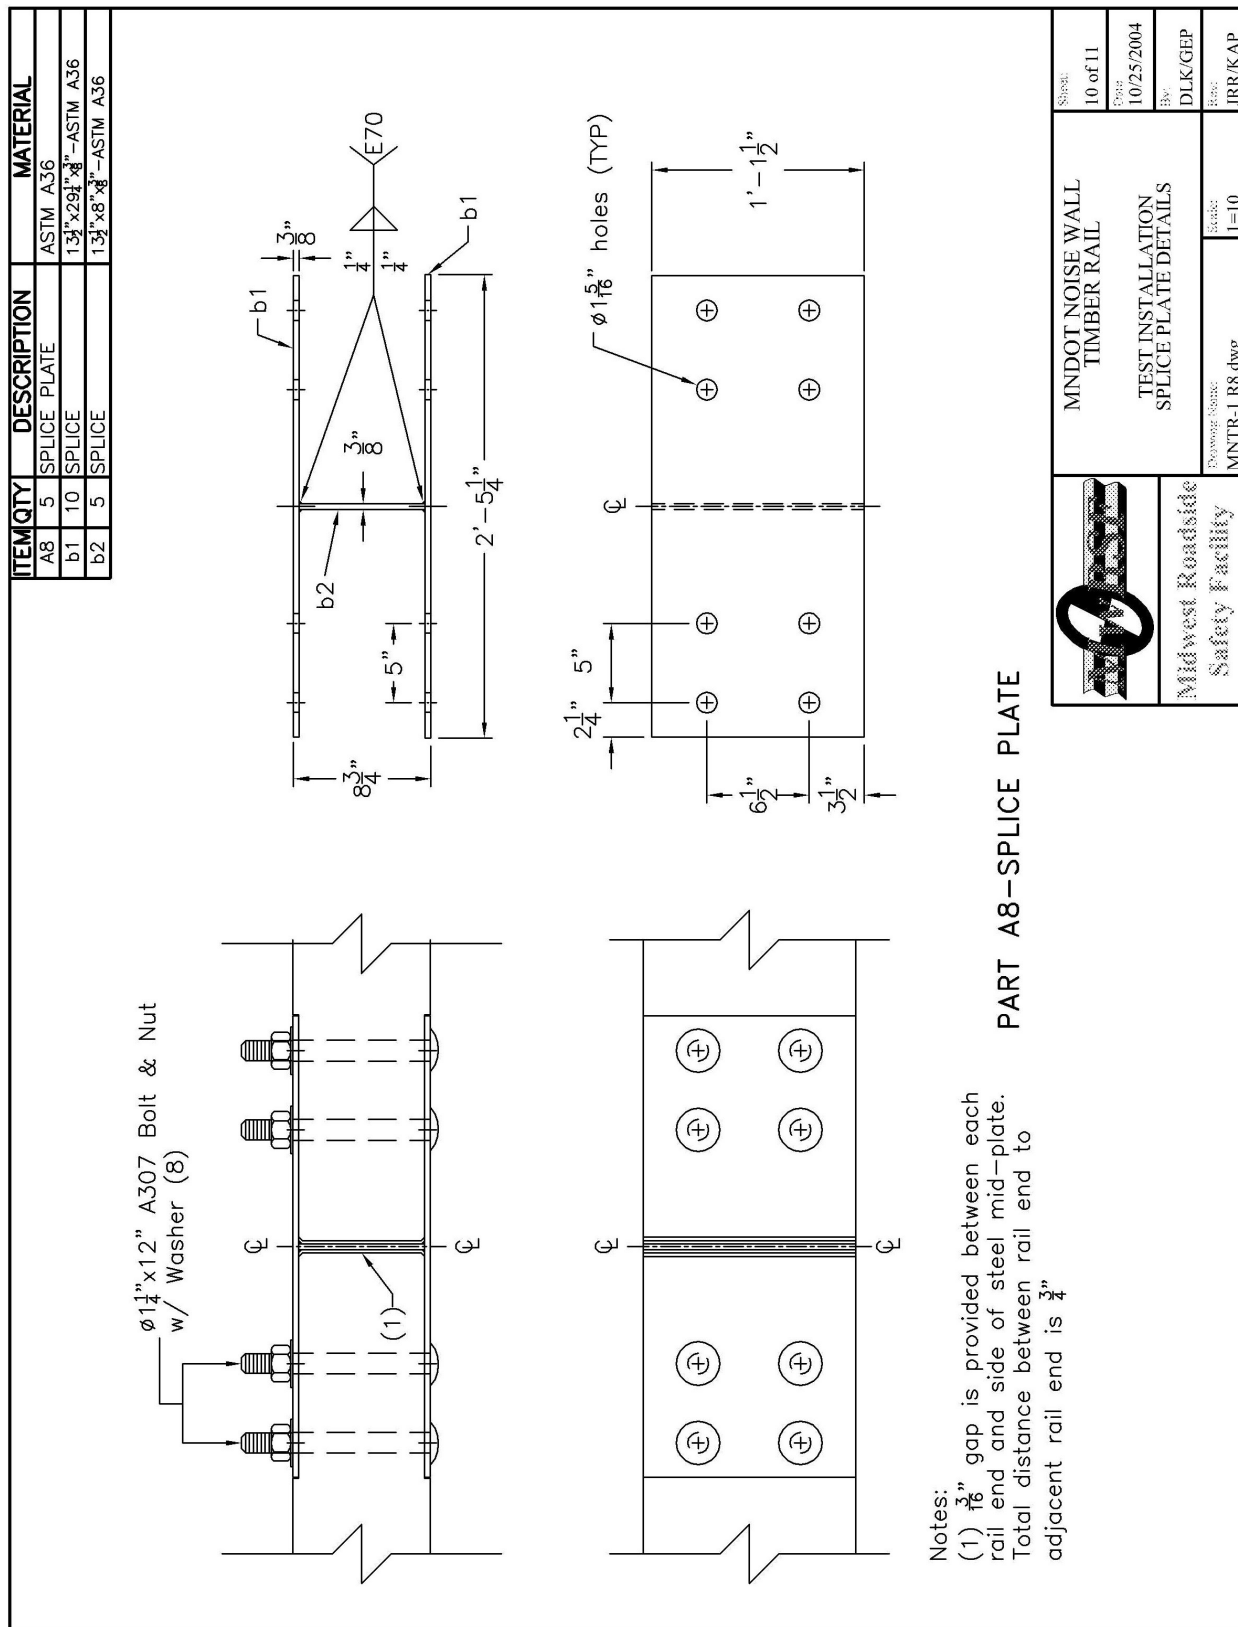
Mn/DOT's Timber Rub Rail Design Splice Plate Details (English)
